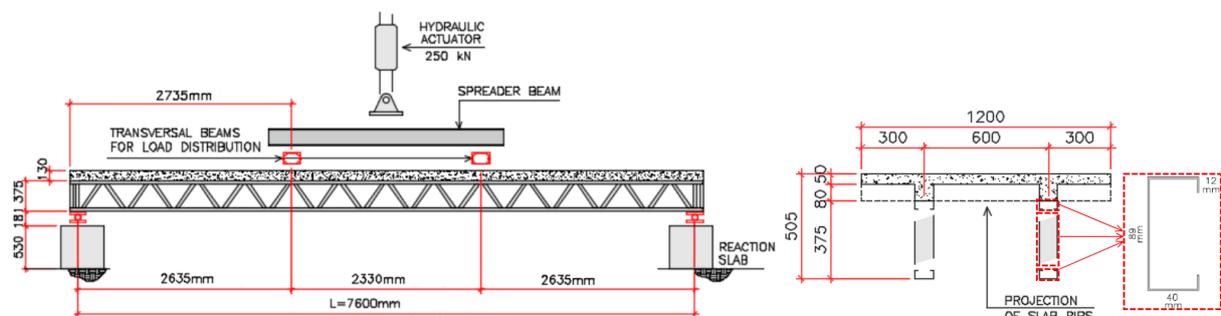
(a) Experimental set up of the four points bending test; (b) cross section of the floor system, dimensions in mm (Leal [6]).
